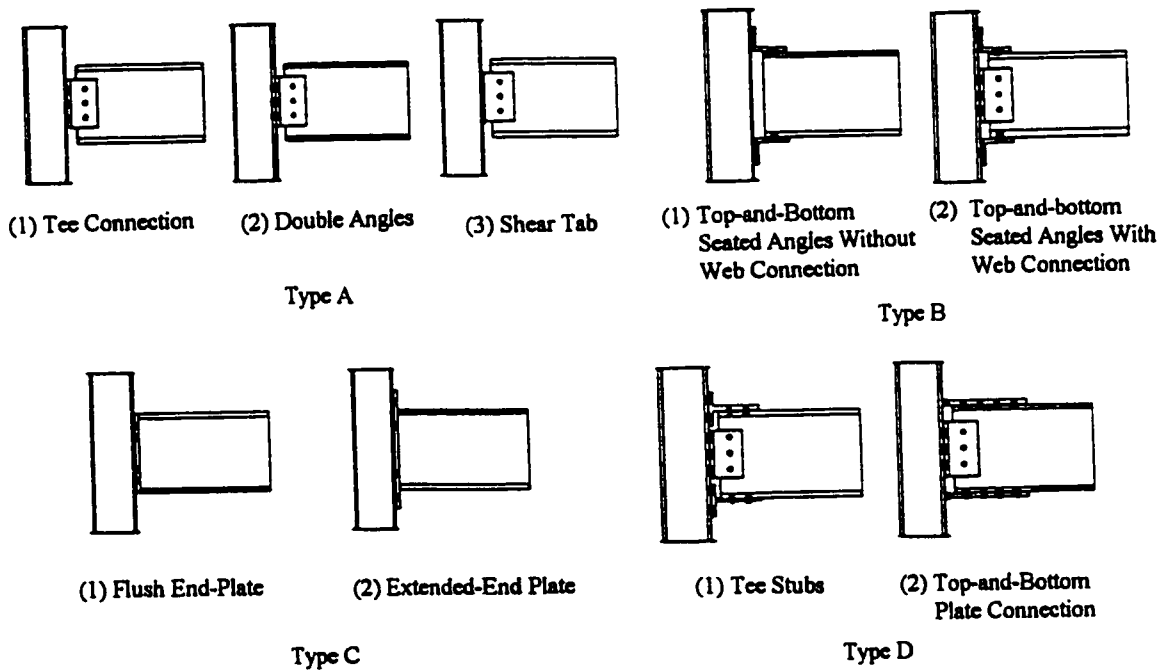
Beam-to-column connections used in steel frames (after Nader and Astaneh, 1992).
